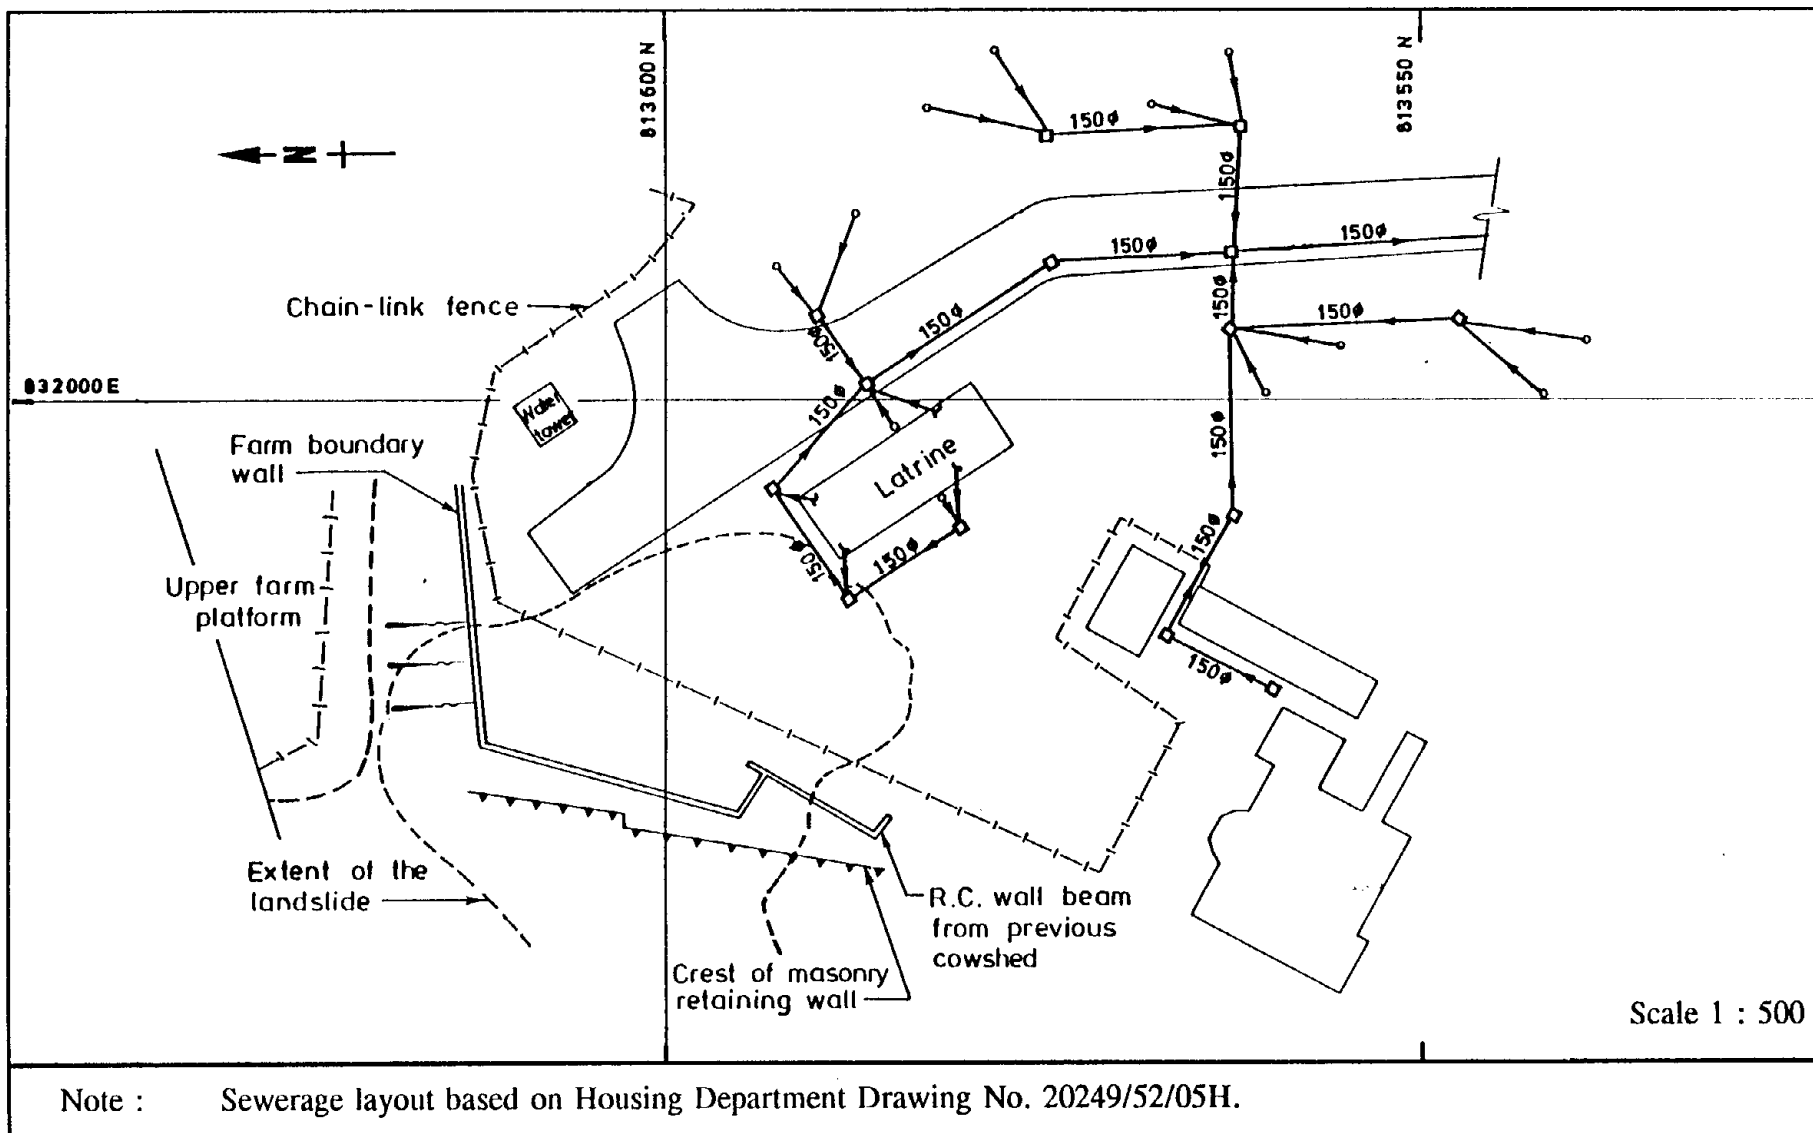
Sewerage Layout at Pokfulam THA Sitting-out Area
